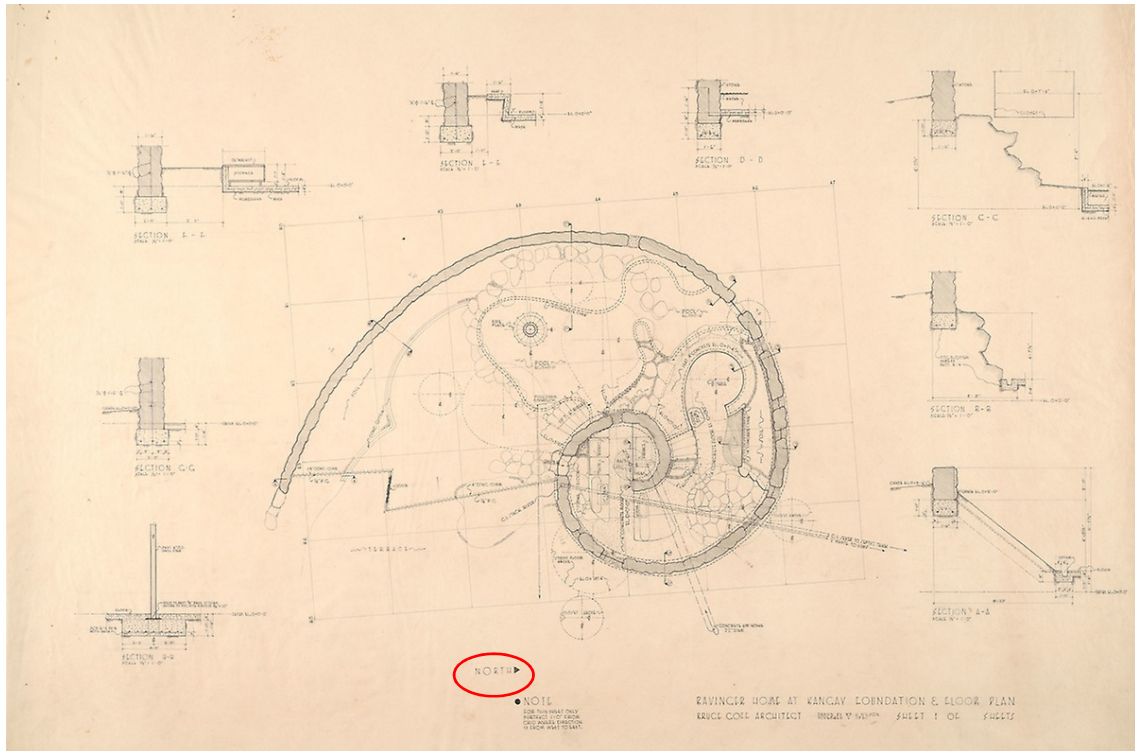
Site Plan oriented with apex facing north. Image provided by the Art Institute of Chicago.
